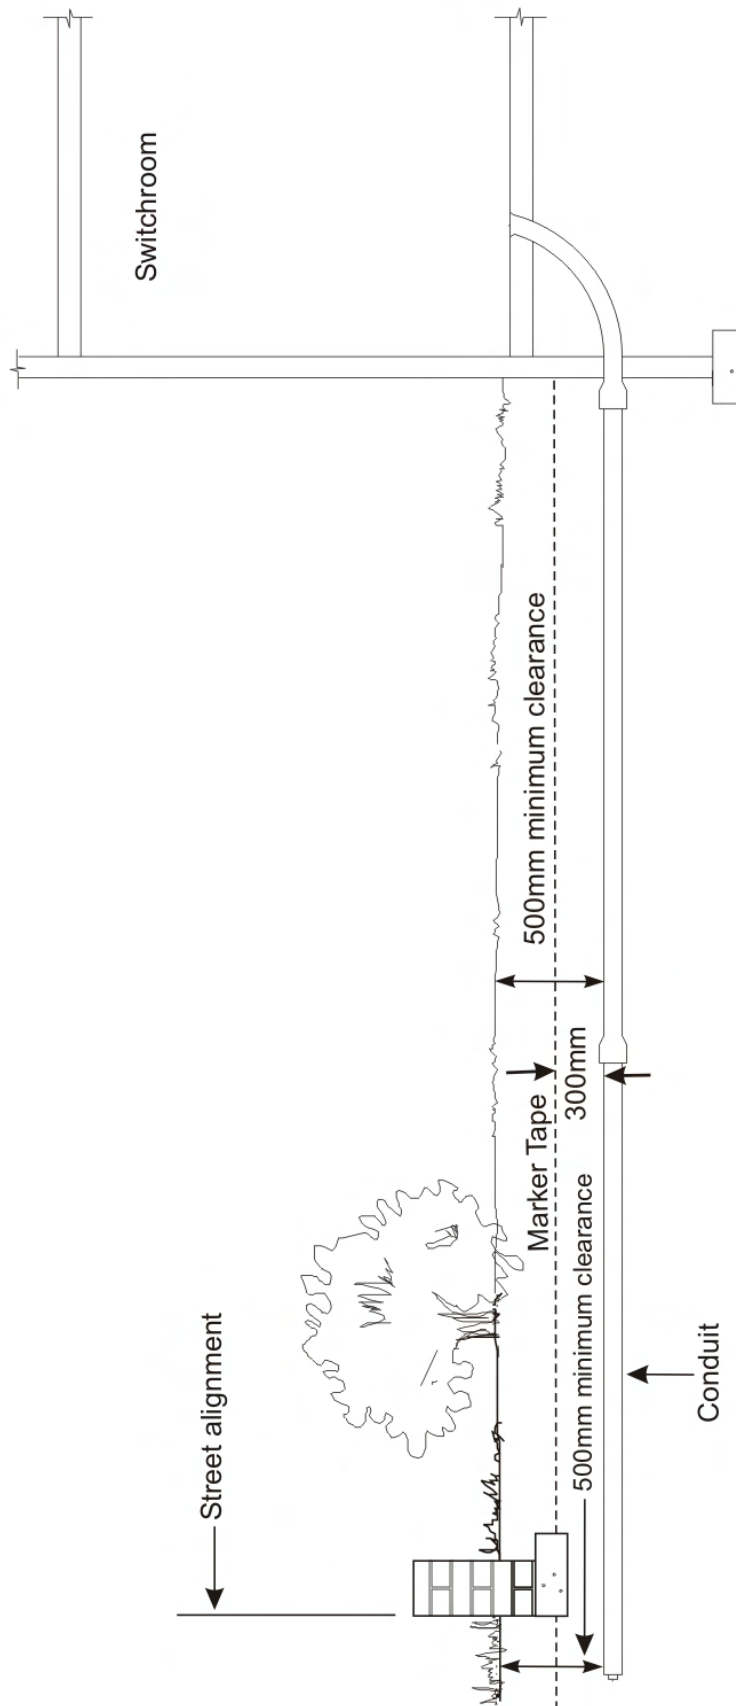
Typical Service Conduit in Domestic Premises
